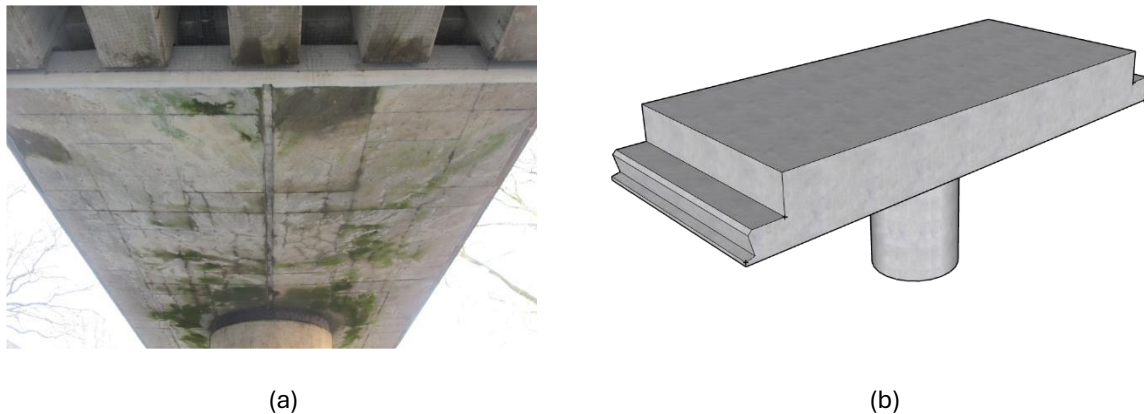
(a) typical ASR-induced surface cracking observed on the underside of a pier cap [81]; (b) conceptual depiction of the bridge structure.
